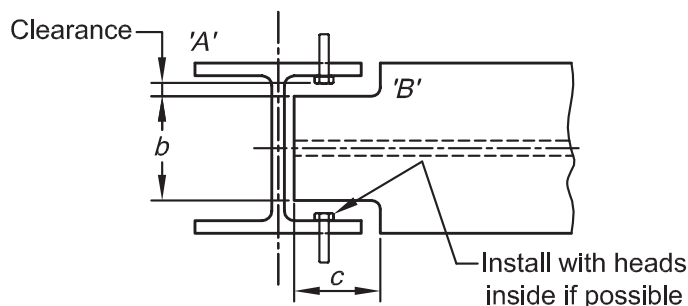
BOLT CLEARANCE FOR FLANGE COPING
